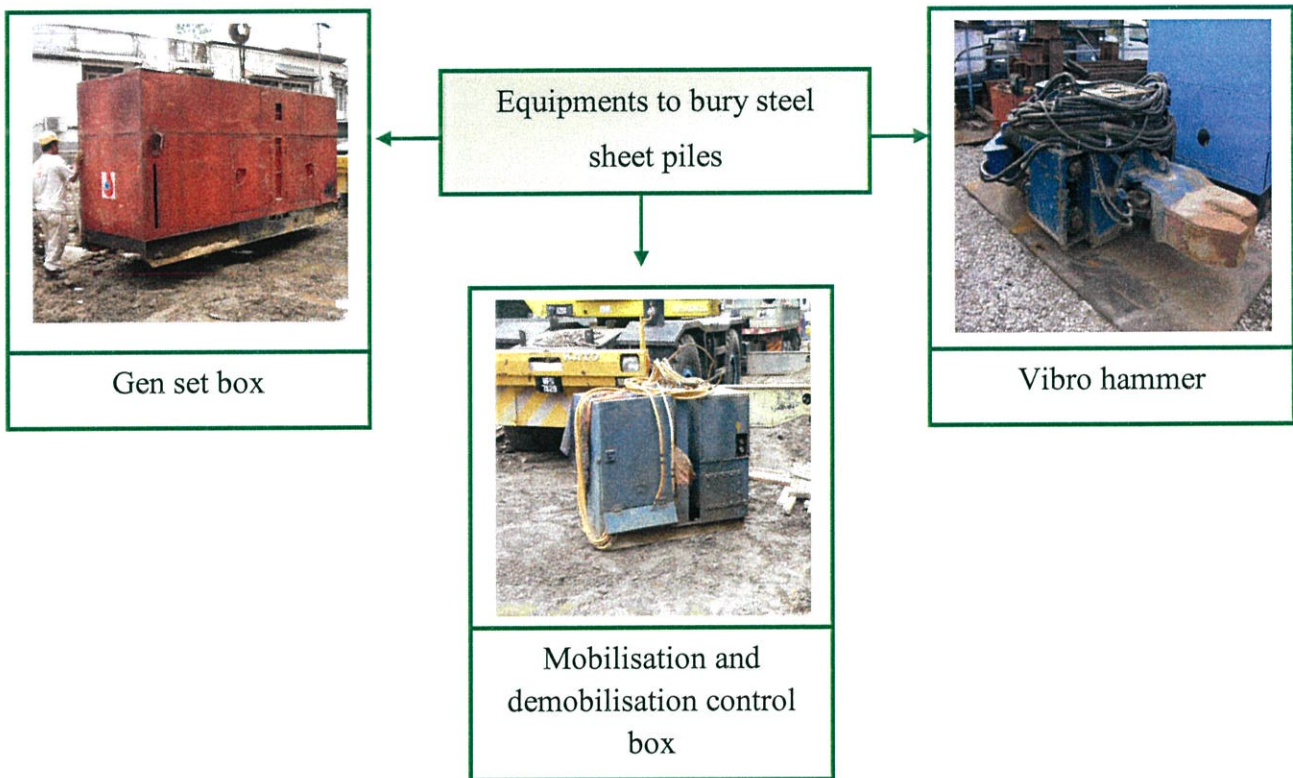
Equipment used to buried steel sheet piles at underground level
